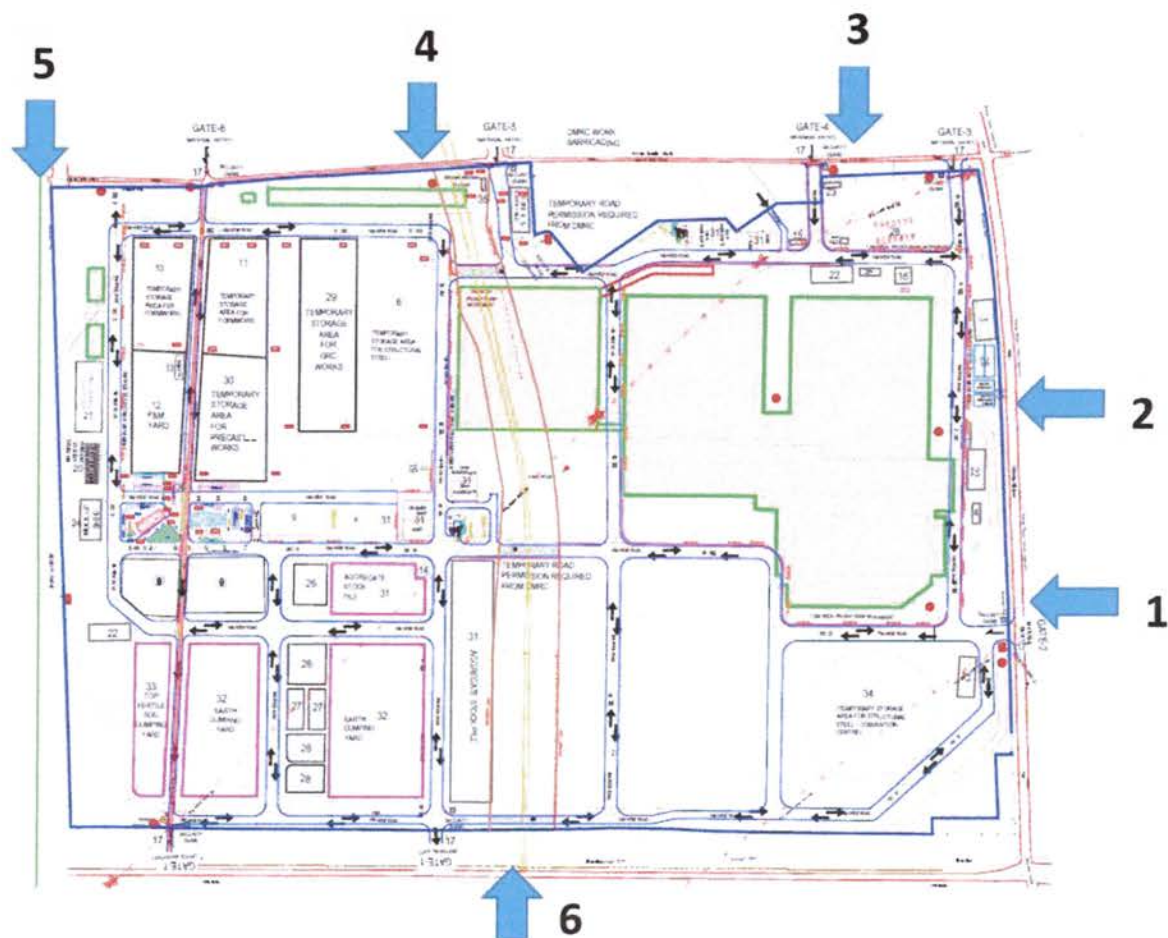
Site Master Plan indicating Viewpoints for the Photographs
